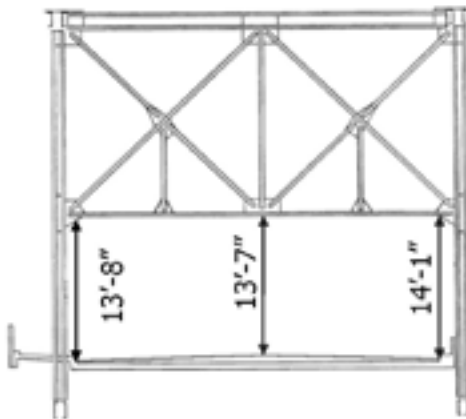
Cross-section view of a through truss bridge showing minimum vertical clearance.
